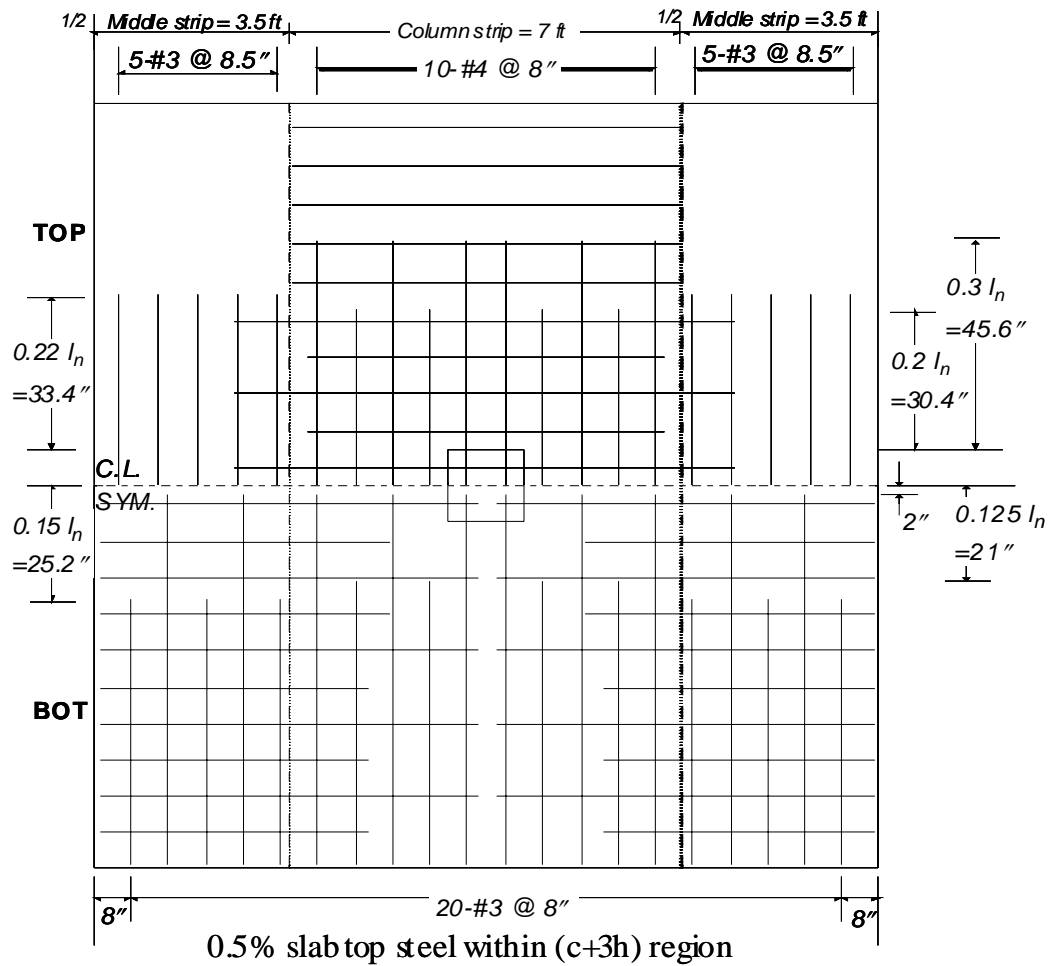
Reinforcement layout for specimens L0.5, G0.5, LG0.5,
